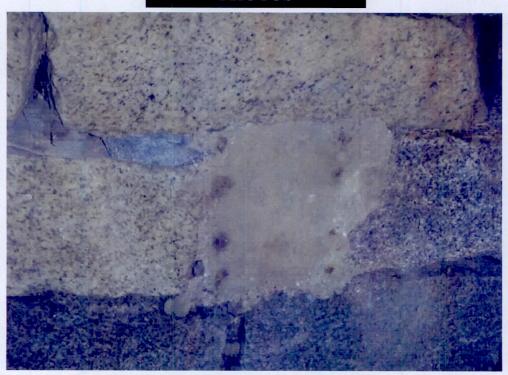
Concrete patch repair in span 2 just west of the keystone at the second block from the north.
